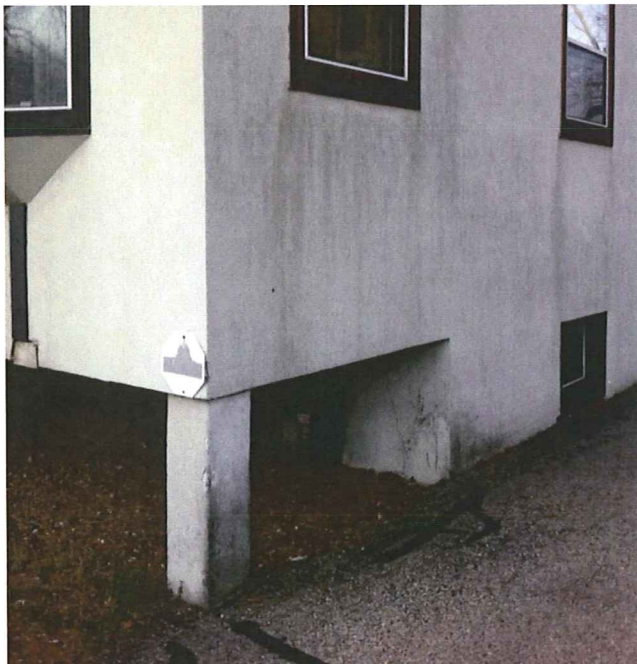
The added "bump outs" are sinking and cracking the existing stucco. Water damage resulting from the improperly hung stucco/drainage is visible on most windows (the dark "waterfalls" stemming from the bottom corners).
